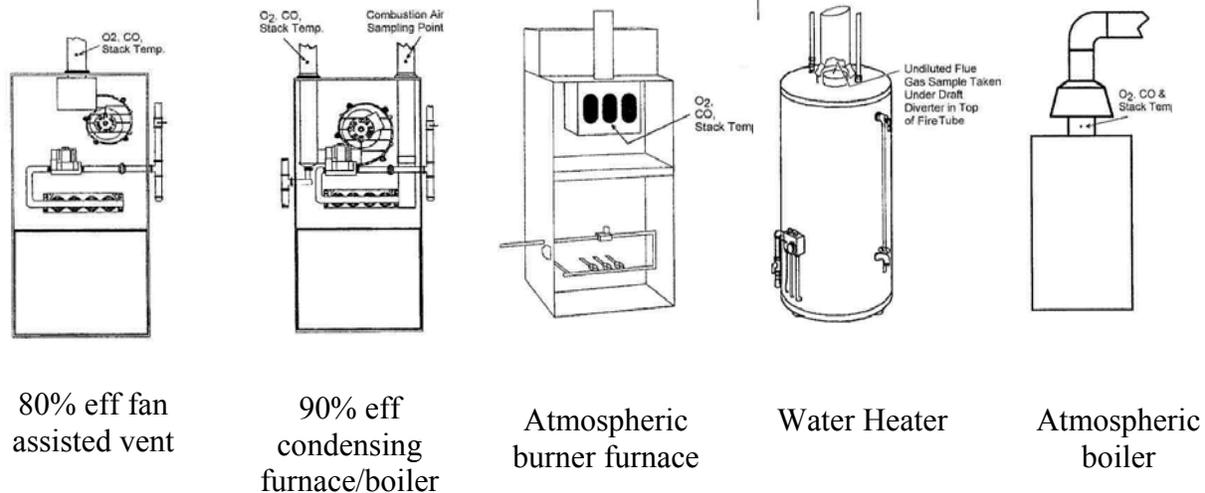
Proper locations for the combustion gas analyzer probe to be inserted into the flue stack.
